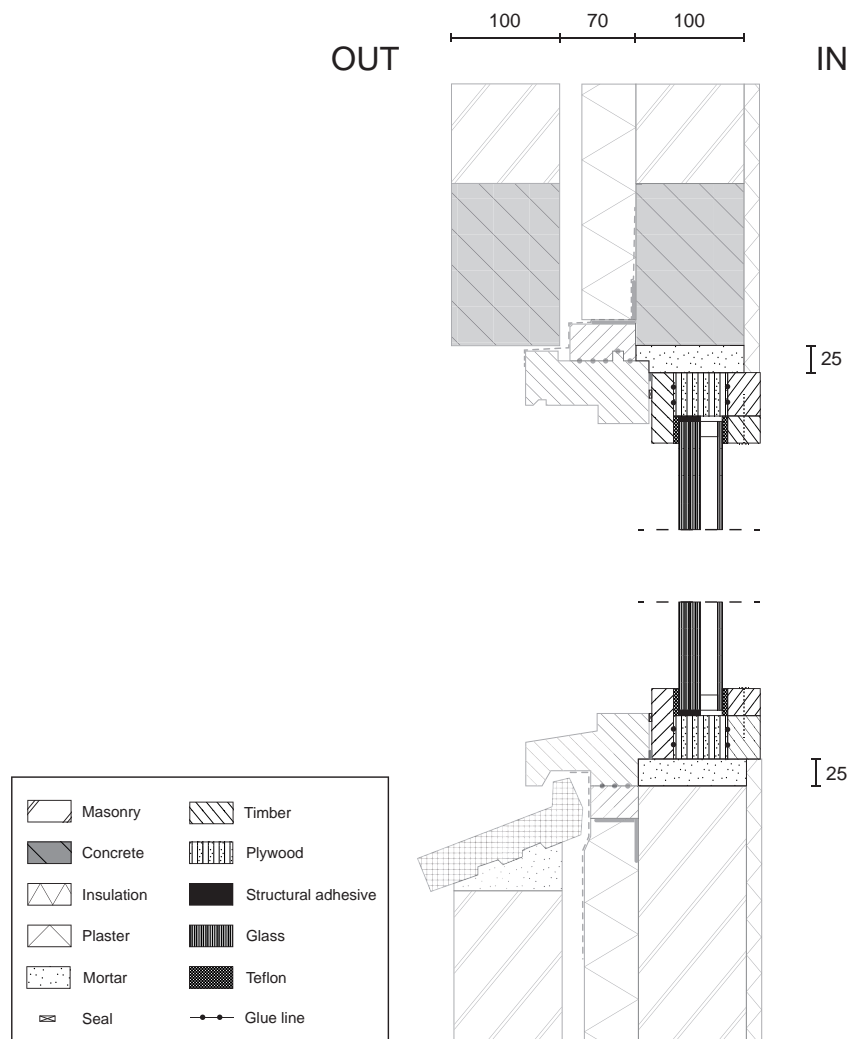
Prefabricated structural window placed into the existing structure in line with the inner leaf.
